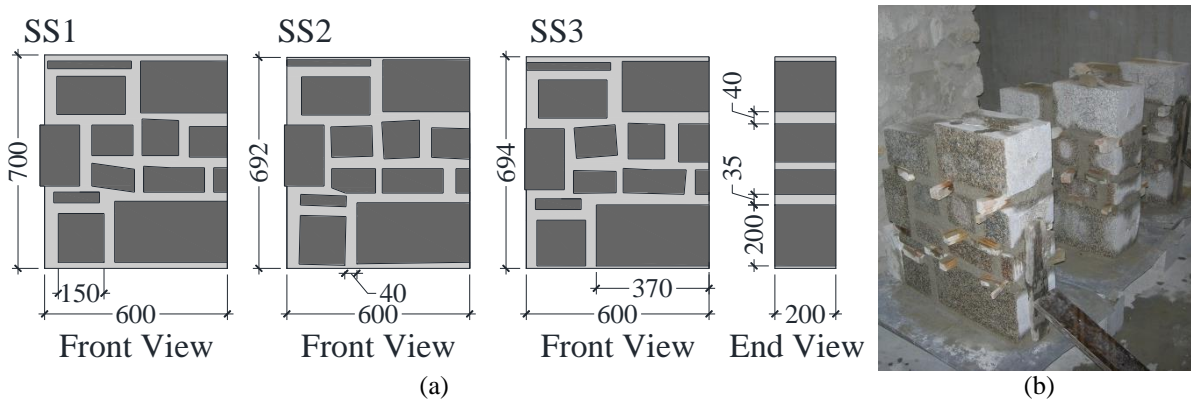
Semi-irregular masonry wallets: (a) geometries (dimensions in mm); and (b) construction
